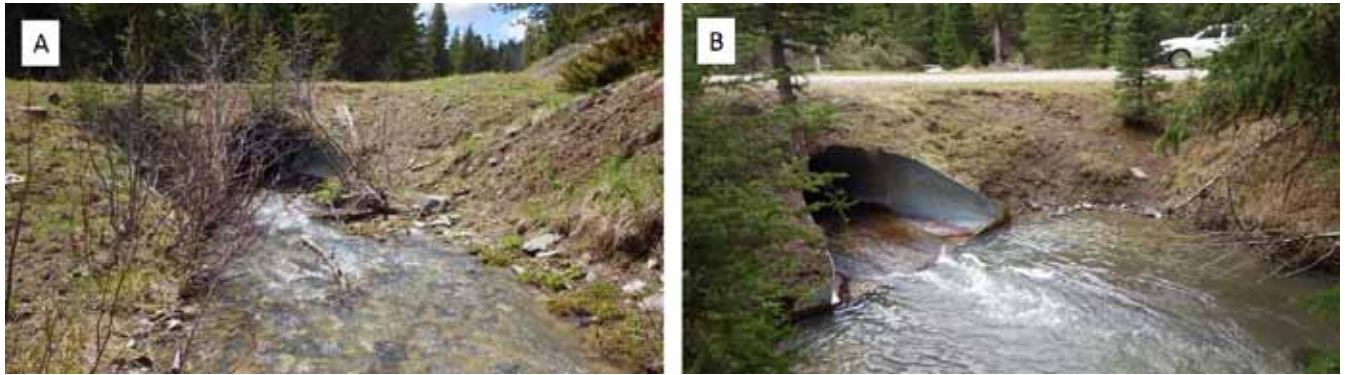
View looking downstream toward the Lodgepole Creek culvert inlet (A) and upstream toward the Lodgepole Creek culvert outlet (B). Photos taken May 25th 2016.
